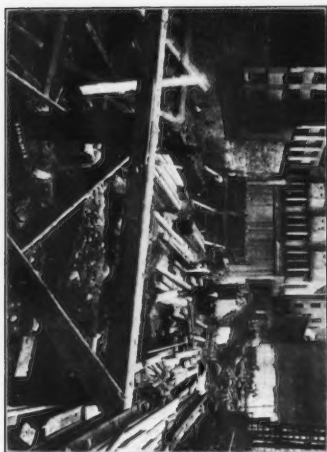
AUGUST 28TH, 1906, PREPARING TO BUILD PLATFORM.
